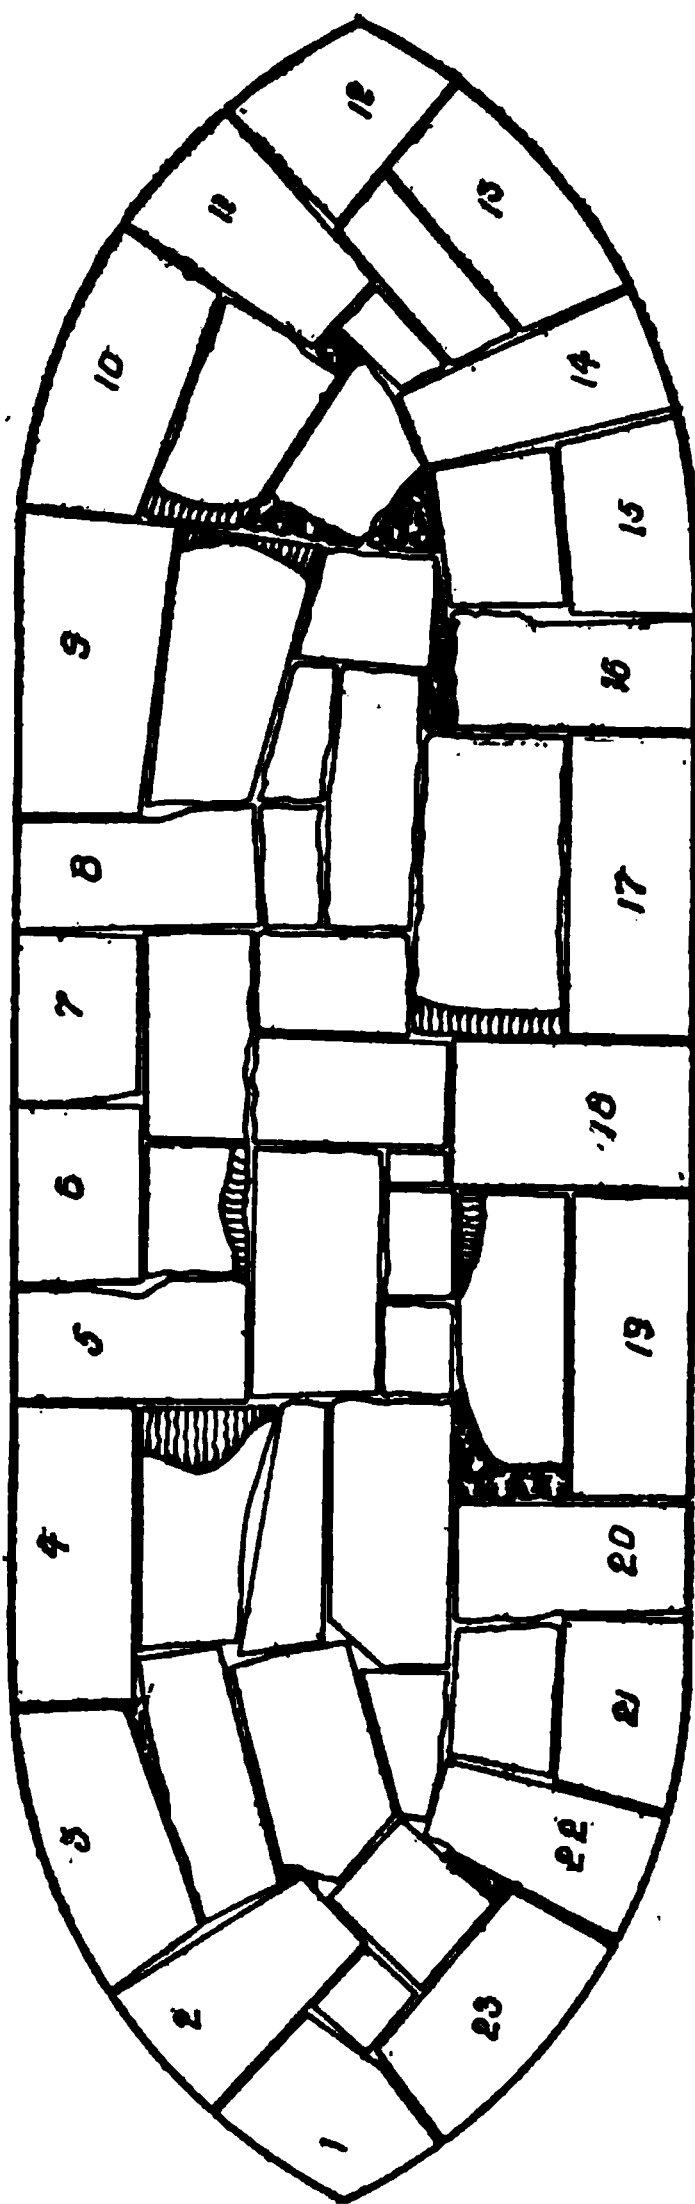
A COURSE OF A PIER OF CAIRO BRIDGE.
